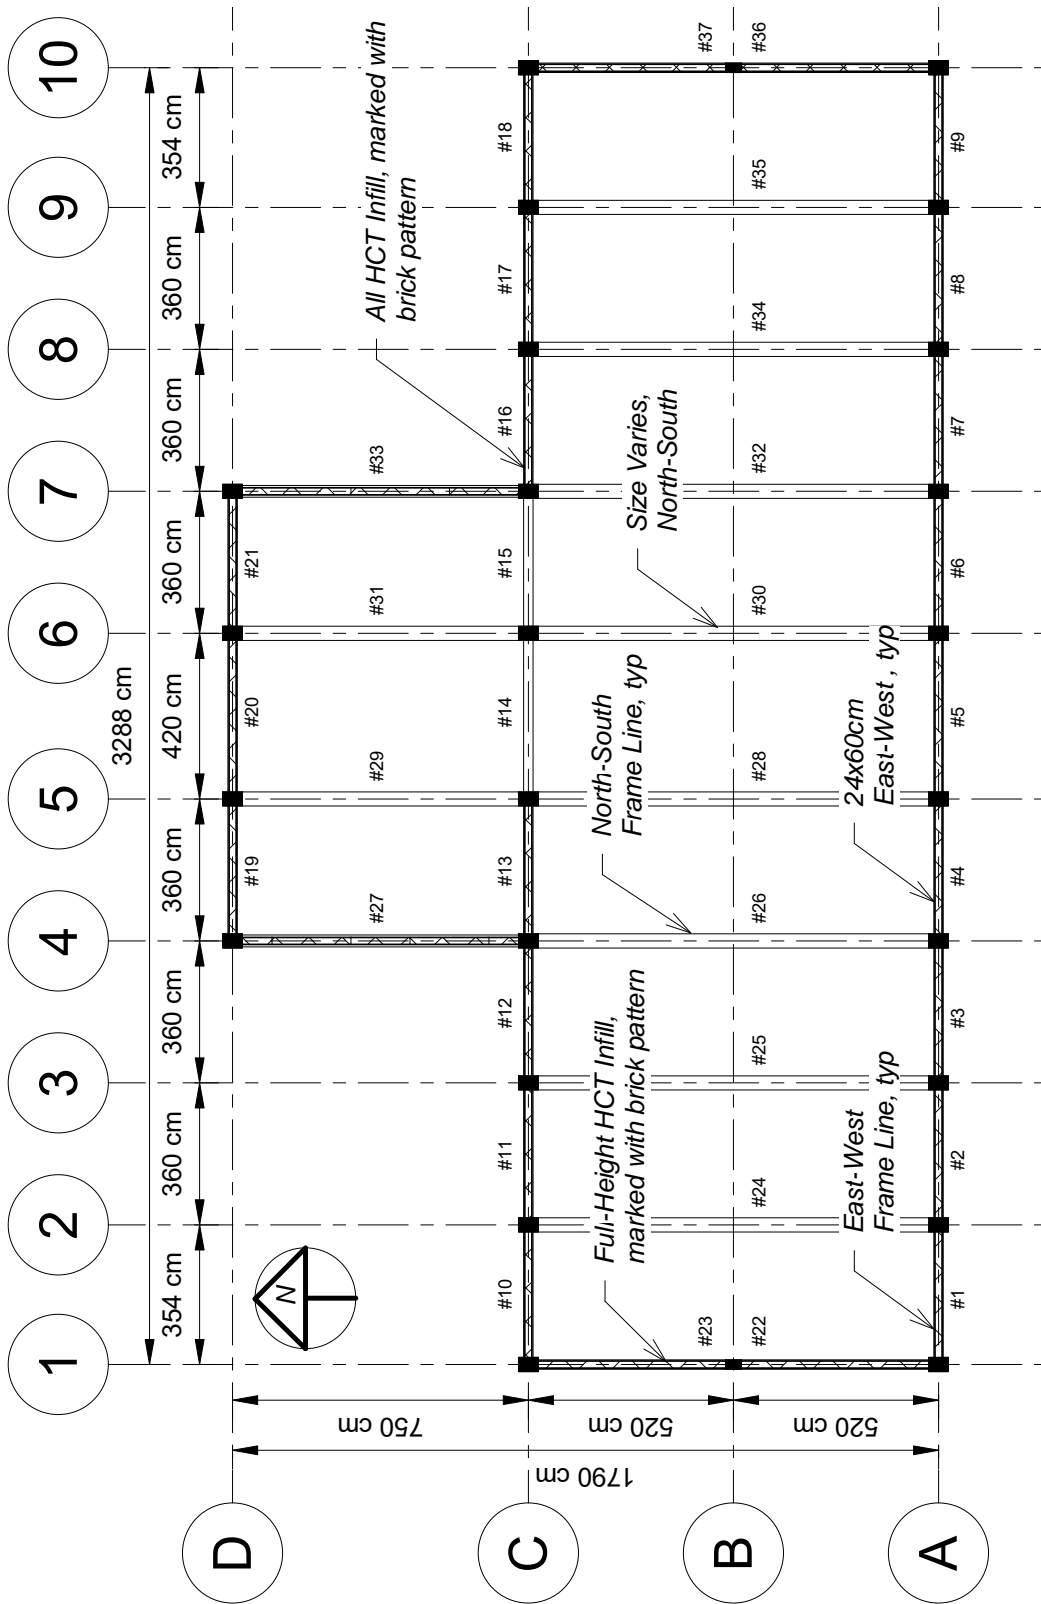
Beam Layout Reproduced from Original Construction Documents
